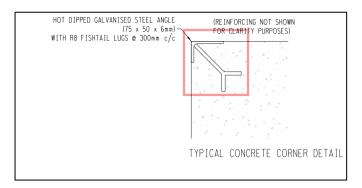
Excerpt showing the protected concrete slabs corner/edge typical detail
